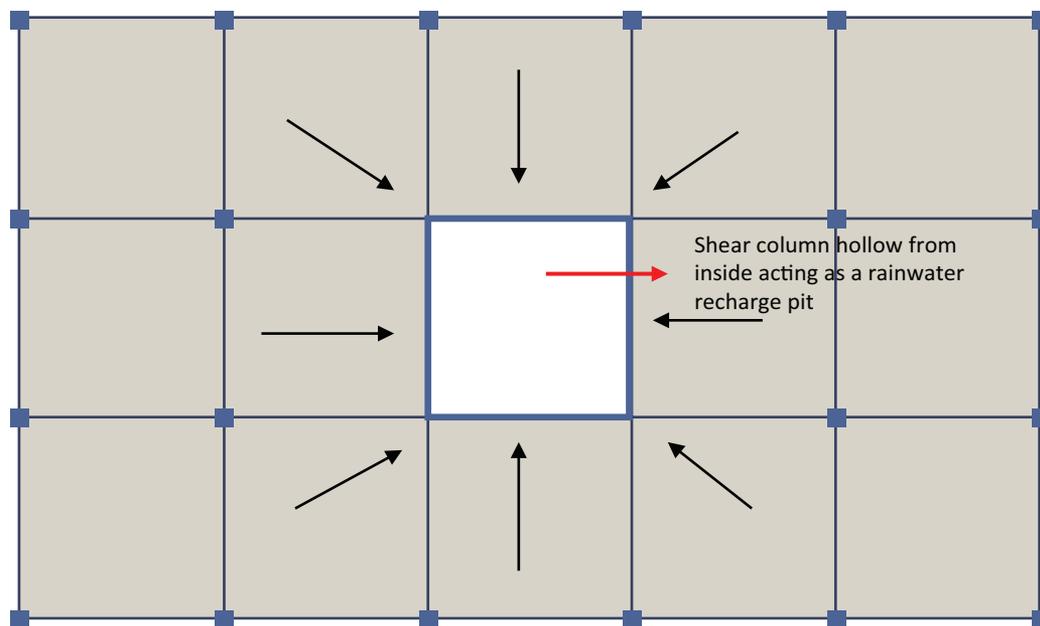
Shear columns in basement acting as groundwater recharge structure
